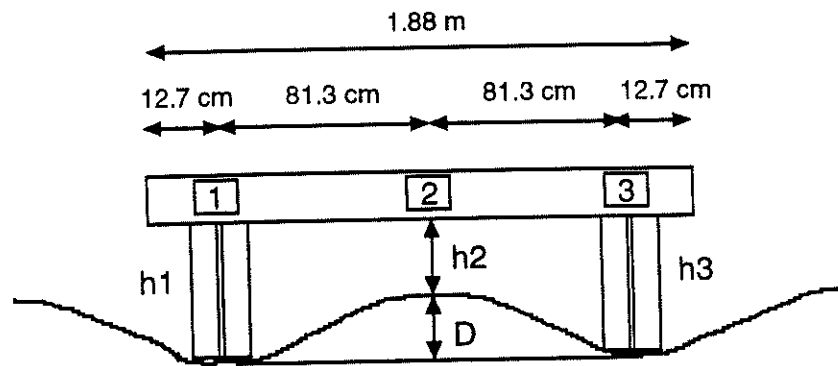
Sensor Arrangement on Three-Sensor Road Profilers
